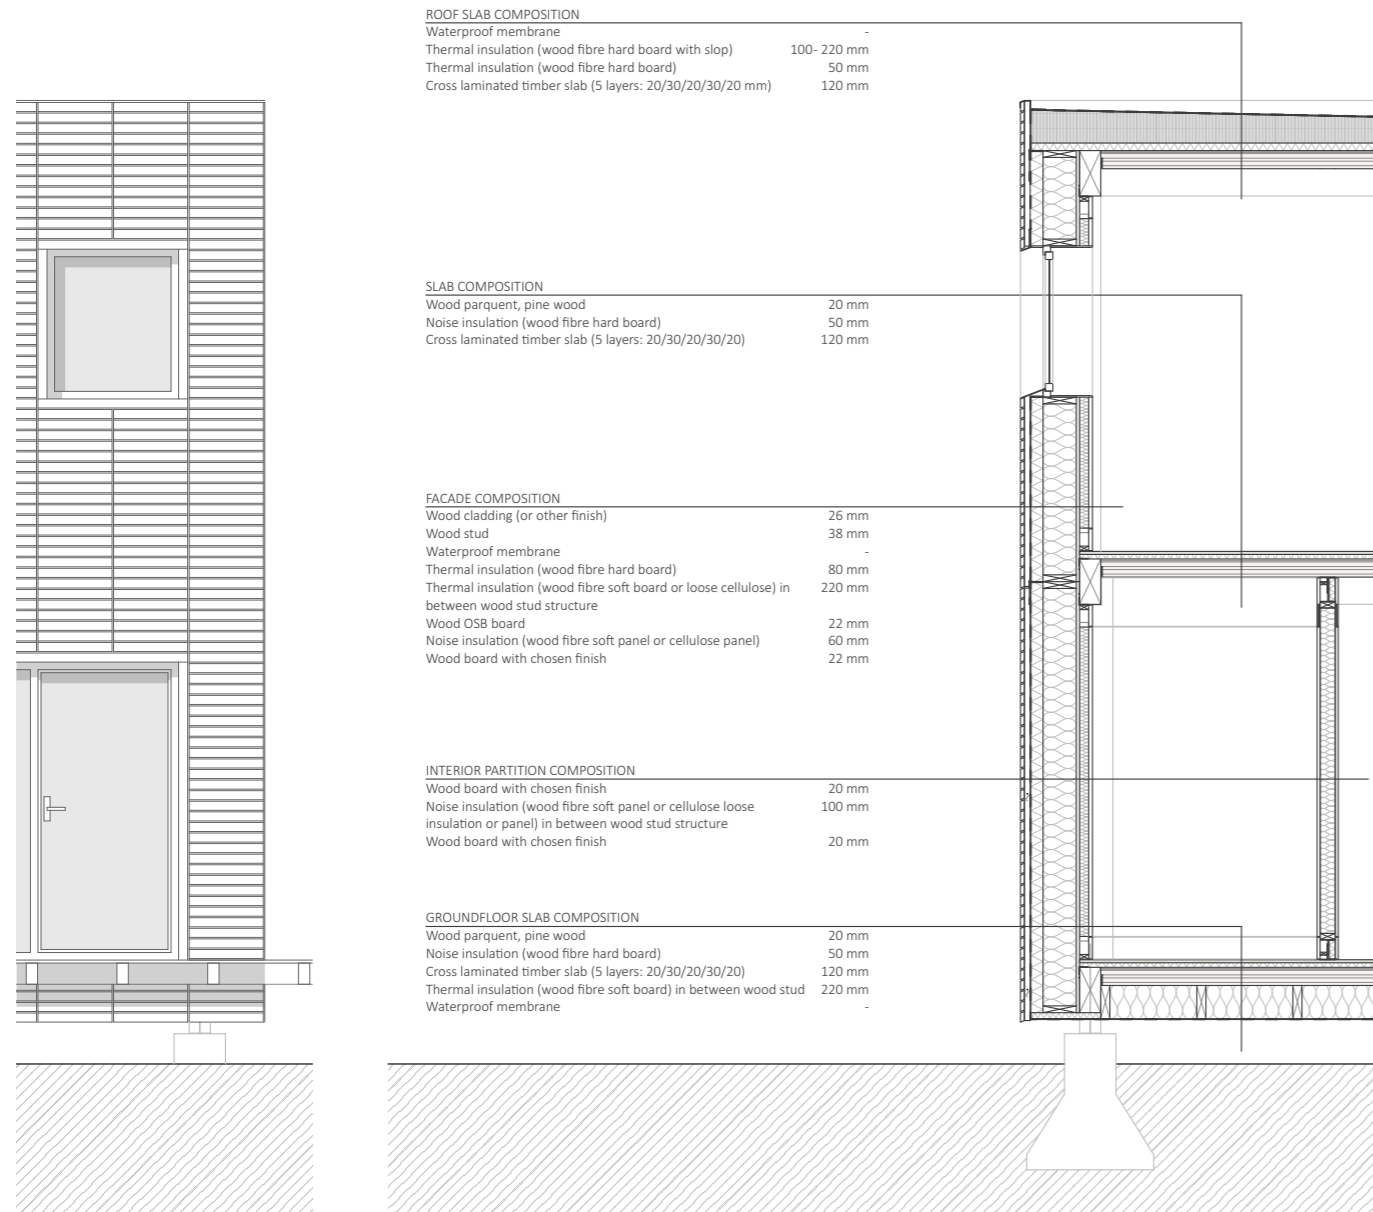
Drawing, Construction section and elevation with composition. ©Personal illustration.
